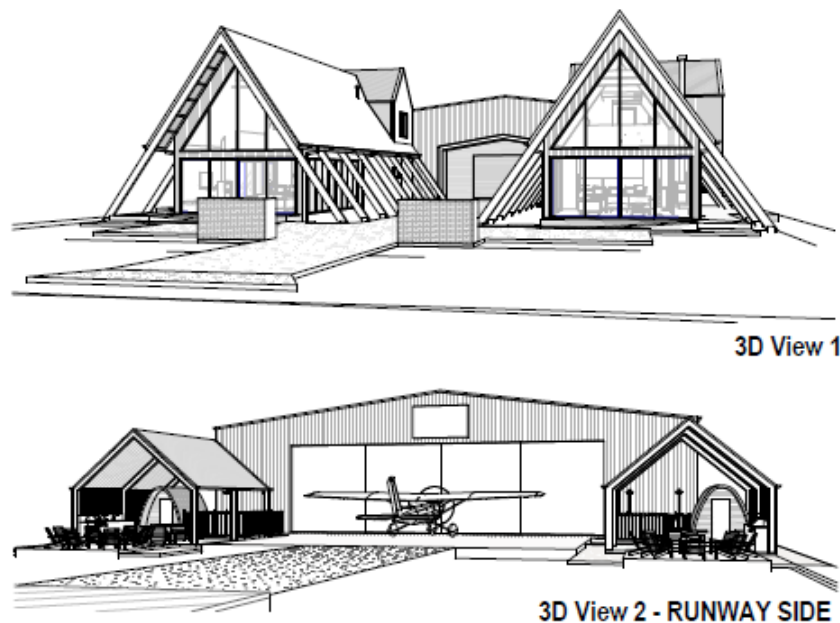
Shows elevations of the accommodation buildings fronting Mill Road and the hangar/recreation facilities facing the runway.
